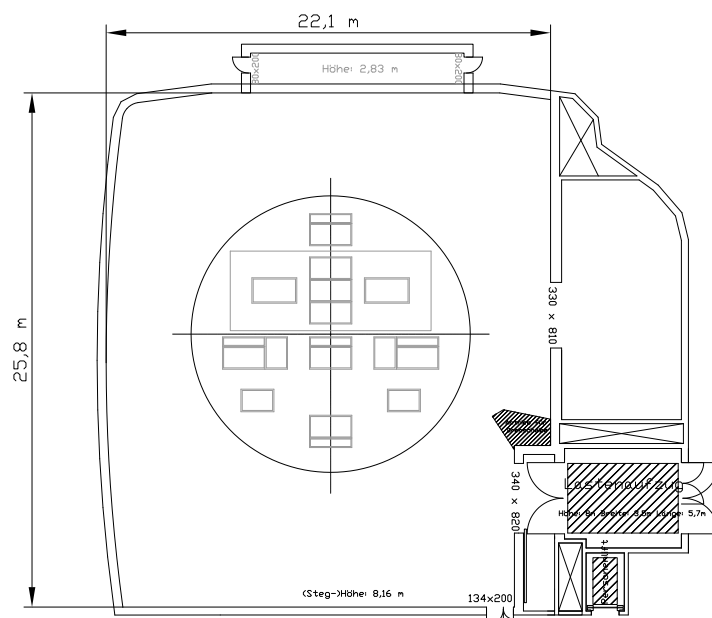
Ground Floor Plan Rehearsal Stage Thalia
